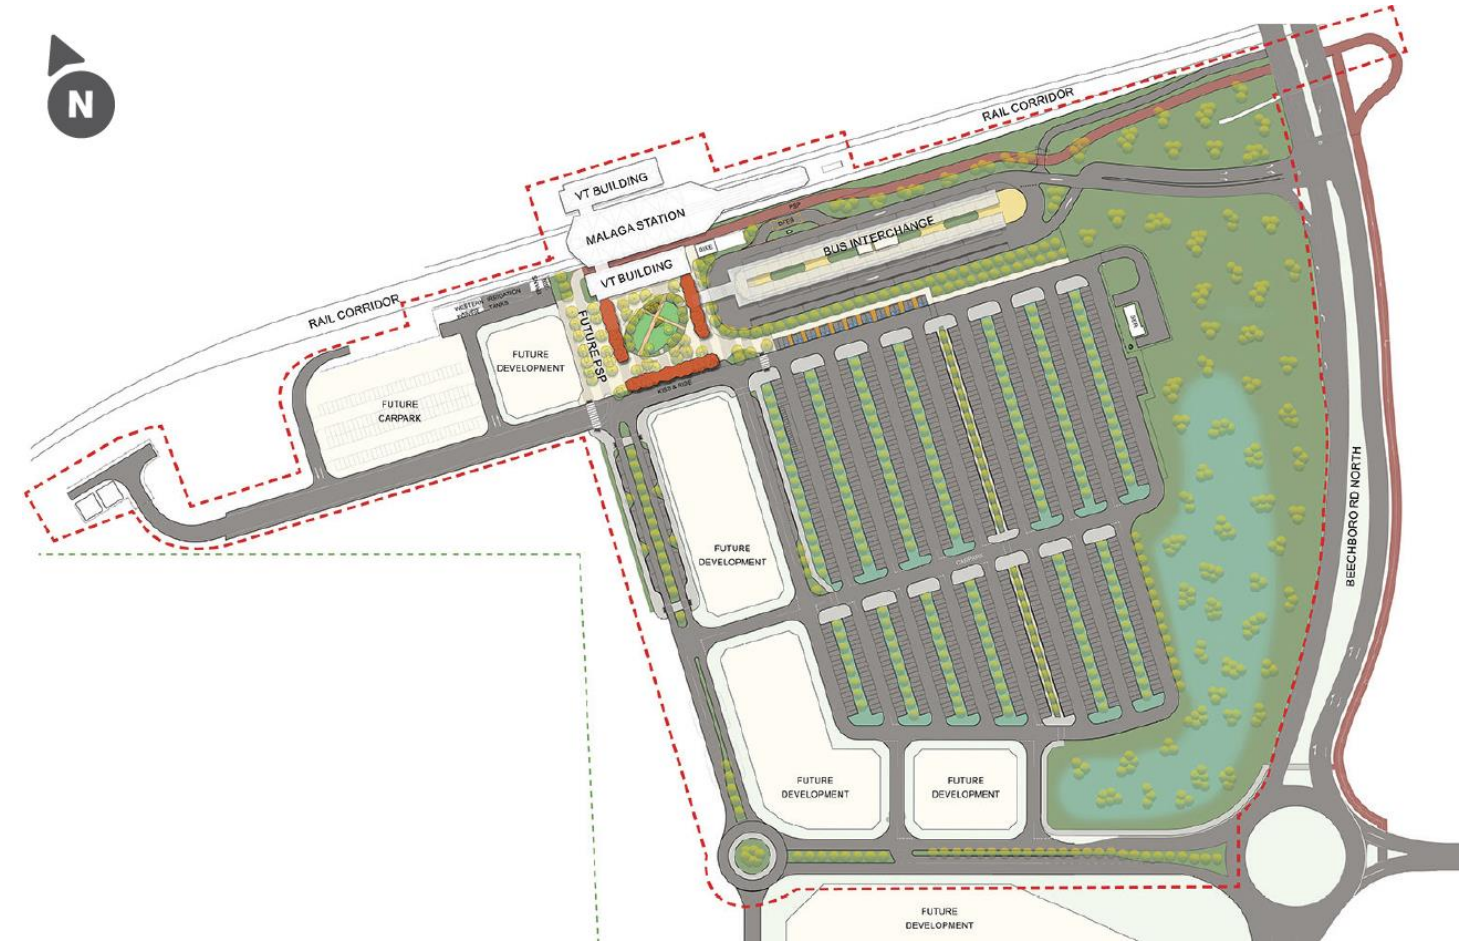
Indicative Malaga Station Plan (source: METRONET Malaga Station Plan Fact Sheet, October 2021)
